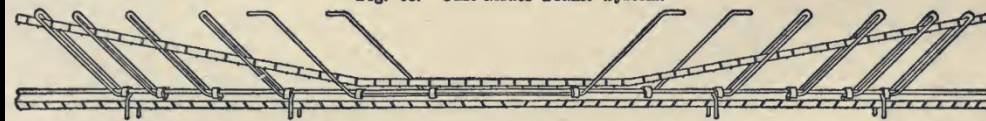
Herringbone Trussed Bar Used as a Girder Frame.
